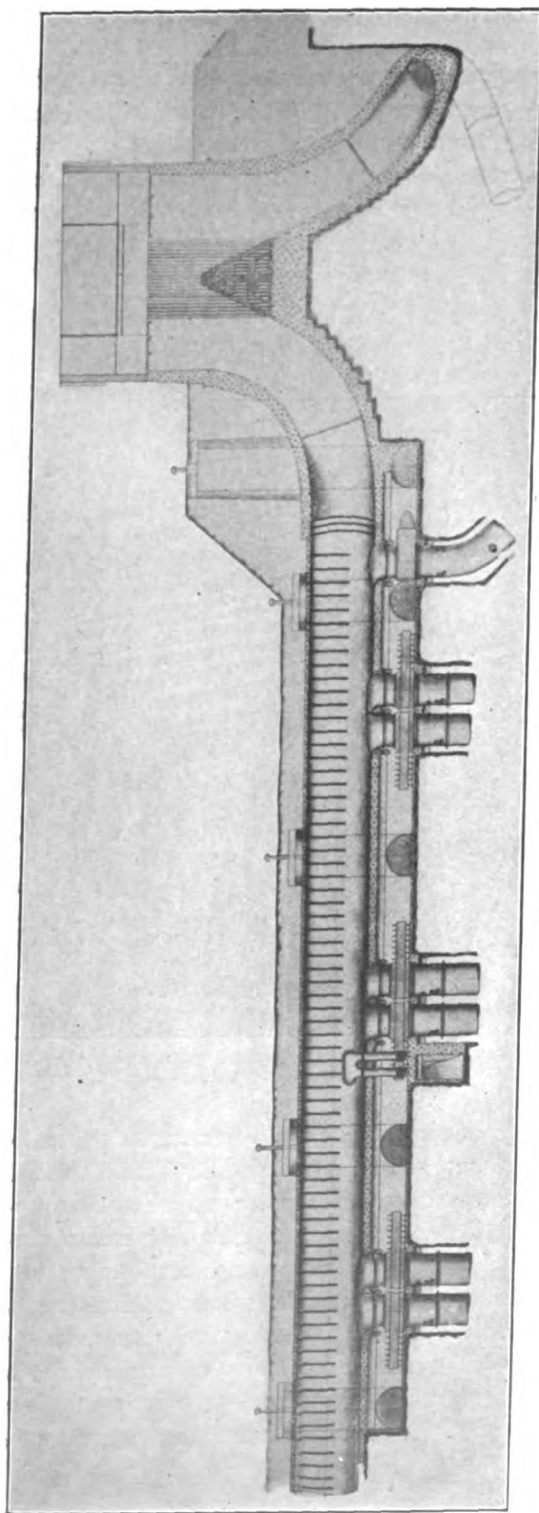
Section through Valve Chamber and Helical Spillway.
